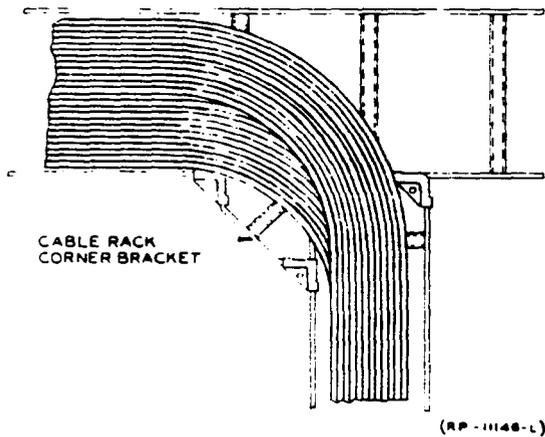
TYPICAL CABLE ARRANGEMENT AT CABLE RACK CORNER BRACKET (PAR. 3.281)
